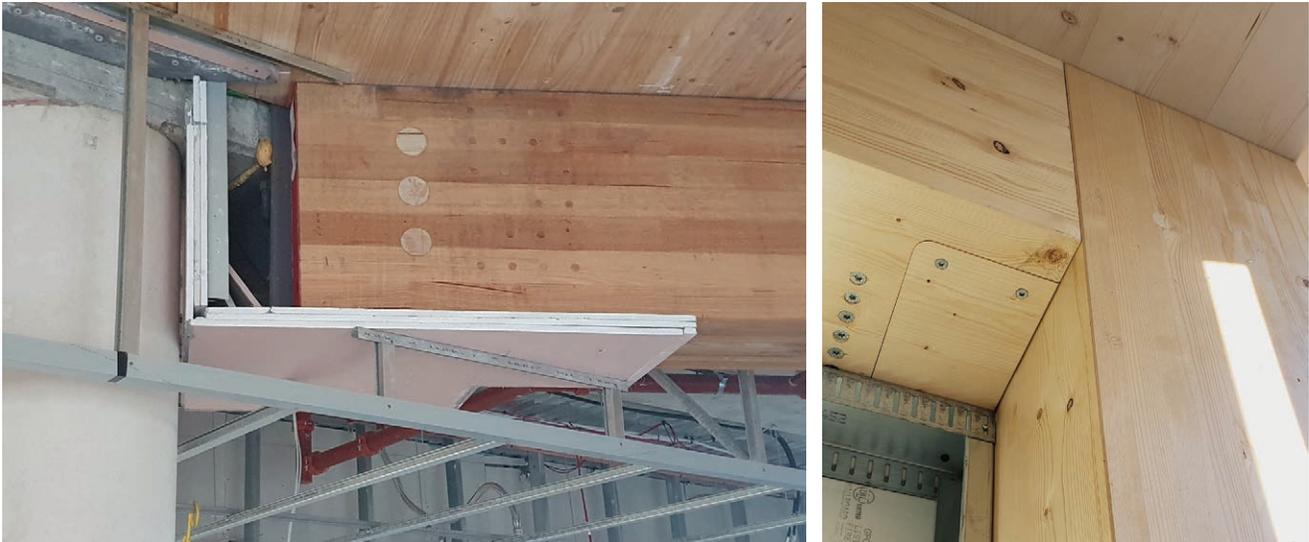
Fire-rated noncombustible board being constructed to protect an external steel connector supporting a glulam beam (left); metal connector covered with timber protection (right)
